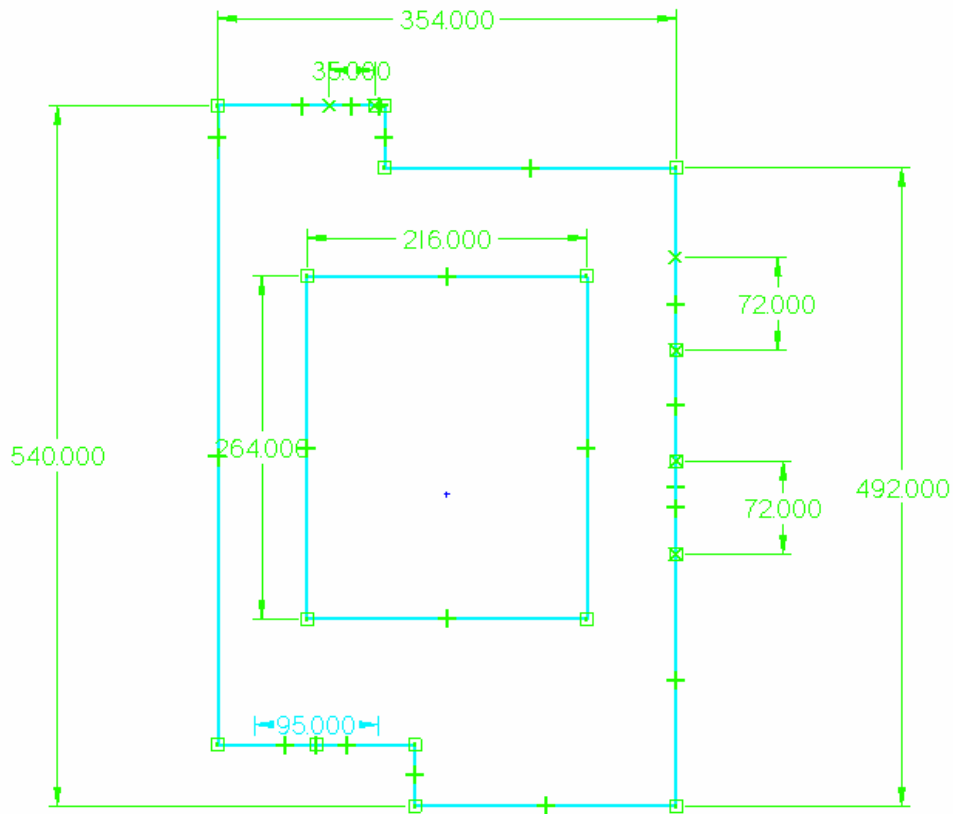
Dimensions (inches) of PRL lab area 105 used to determine machine location
